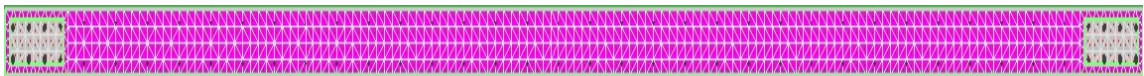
Shear Wall SW200 Cross Sectional Detail
